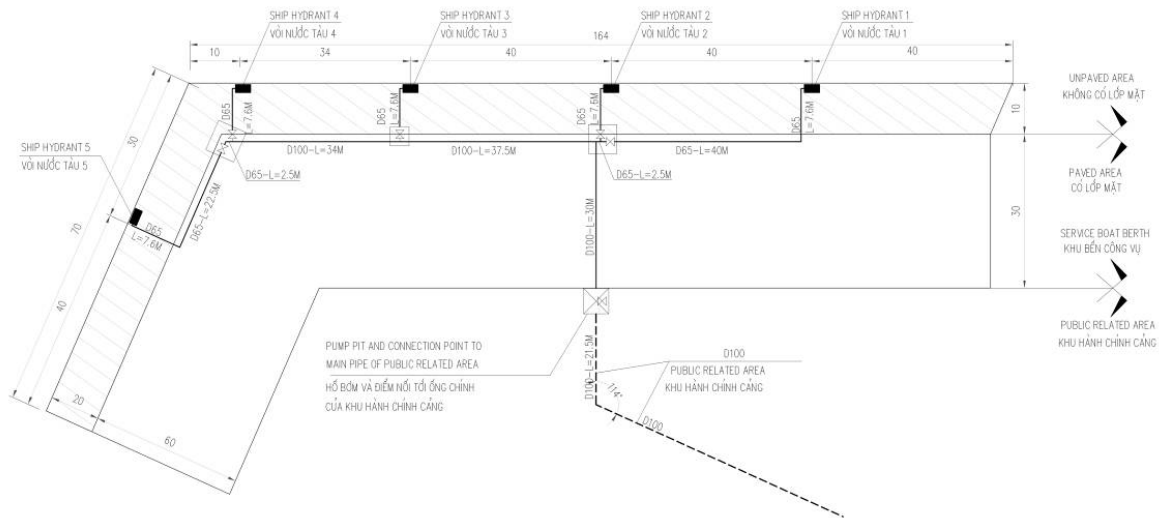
Plan of Ship Hydrant in Service Boat Berth
